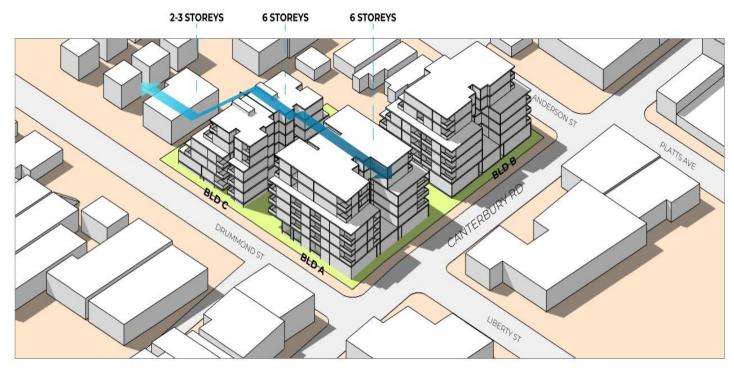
| Proposed Concept Envelopes - Perspective by Aleksander Projects Architects
